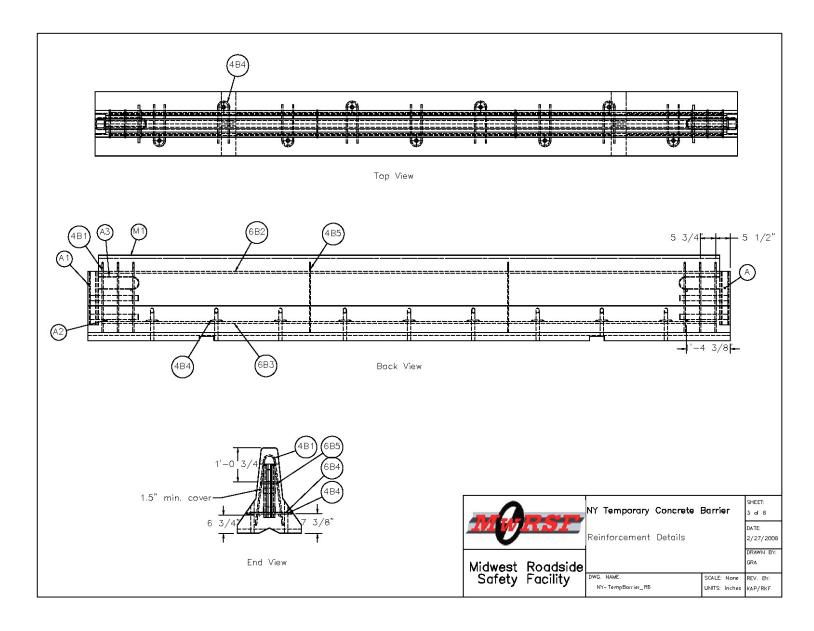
Temporary Concrete Barrier Reinforcement Details (English), Test NYTCB-2
